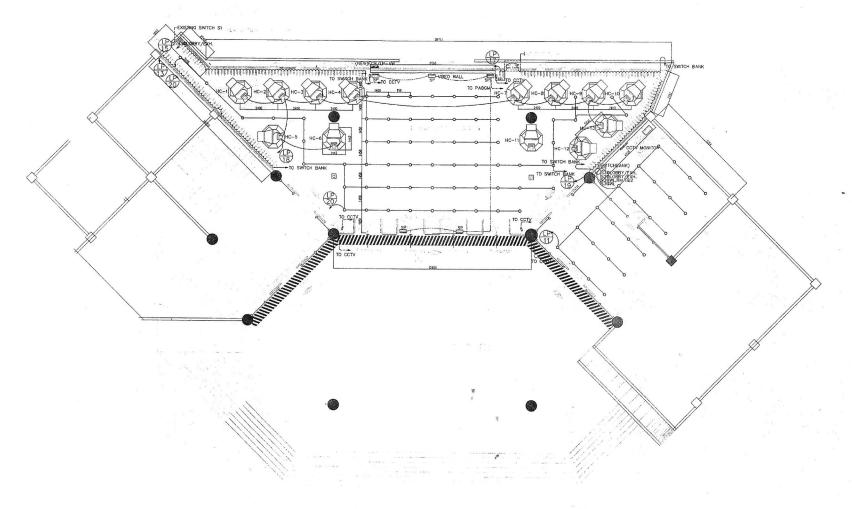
EXHIBIT GROUND FLOOR LIGHTING, & CCTV LAYOUT PLAN 2-1 SCALE: 1: 100 MTS.
